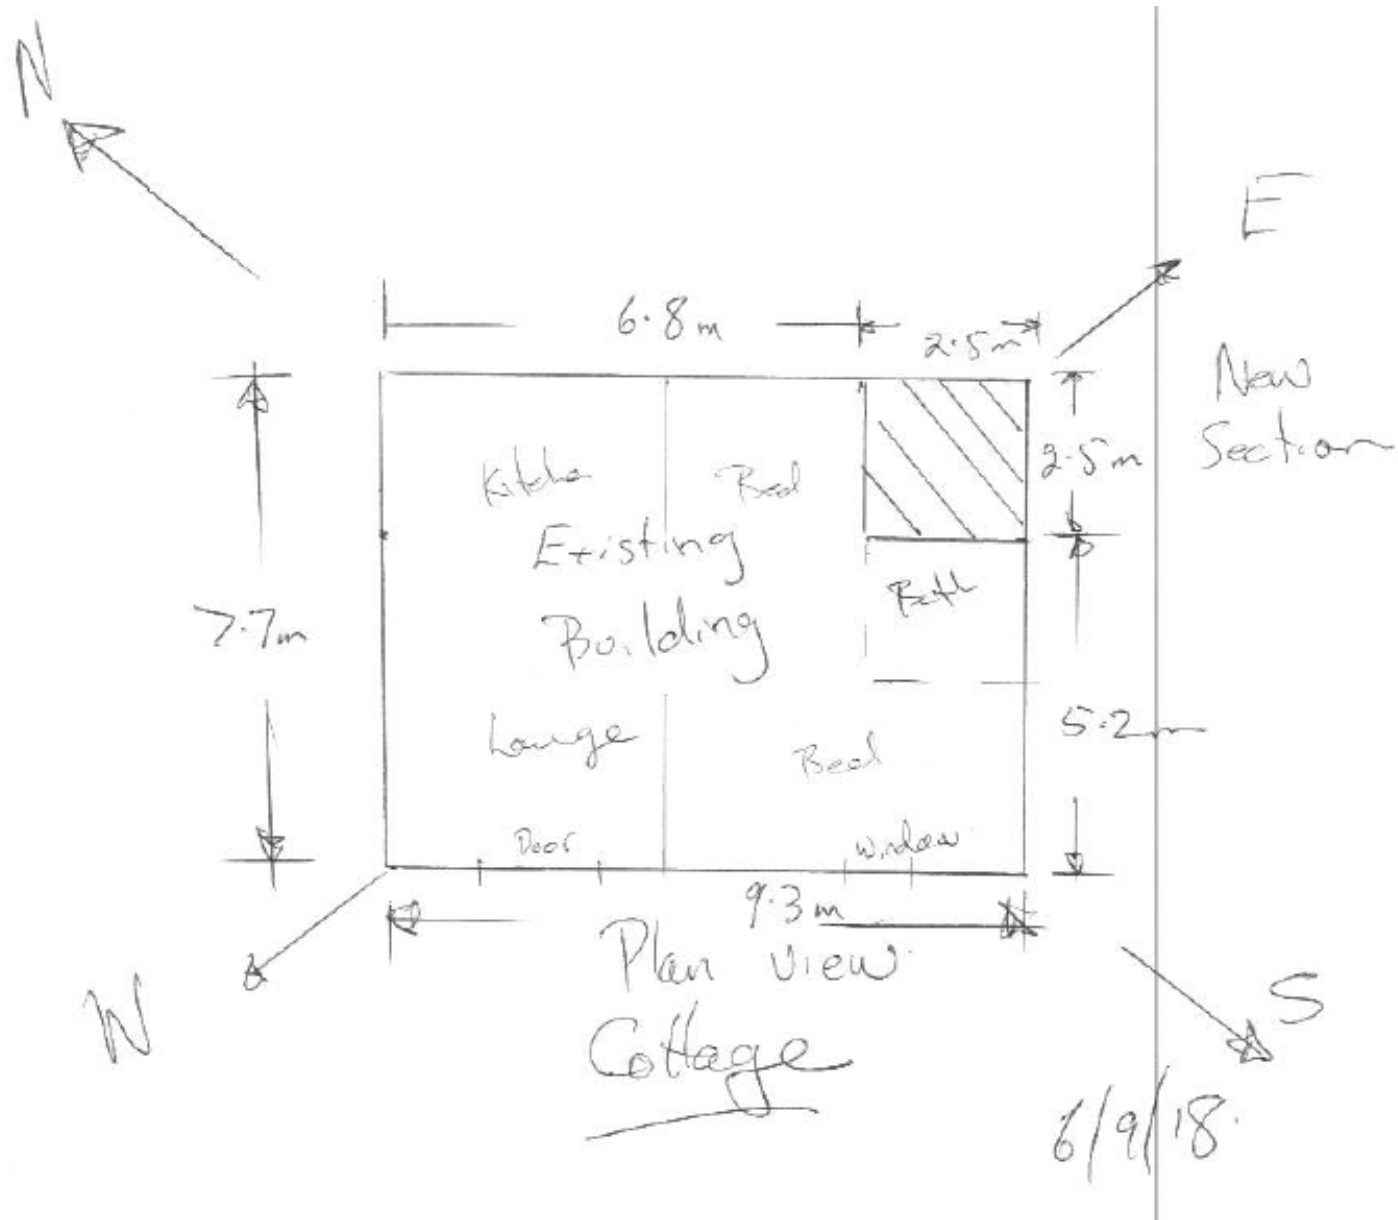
Site Plan submitted by applicant – Bathroom extension to tourist accommodation unit
